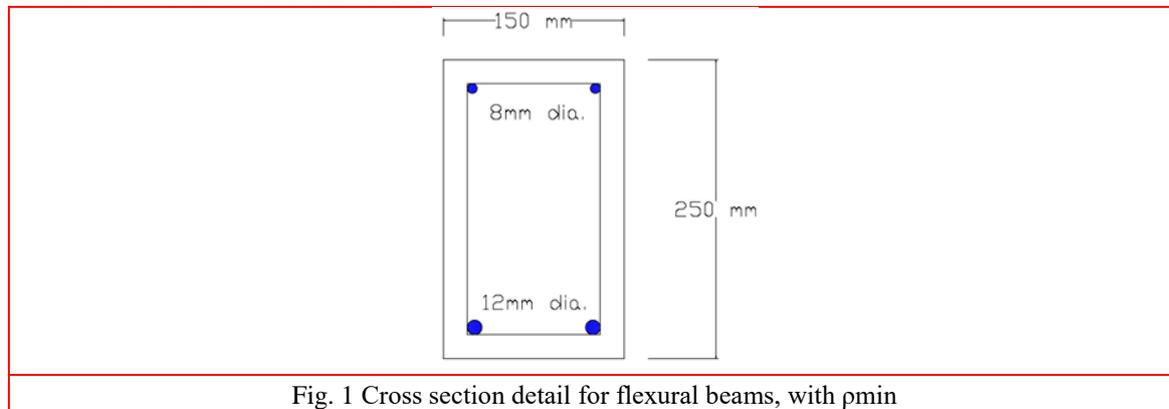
Cross section detail for flexural beams, with ρ_{min}
